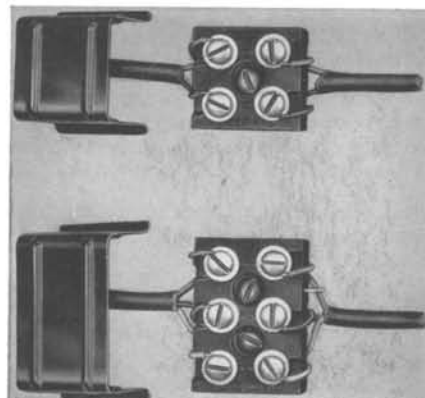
INSTALLATION OF 11- AND 12-TYPE CONNECTING BLOCKS
